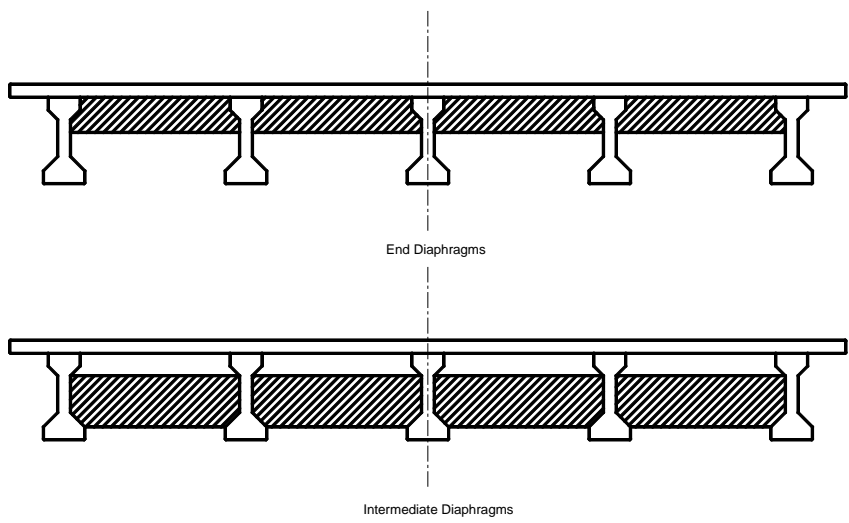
Diaphragm Layout – Wimberley Bridge
